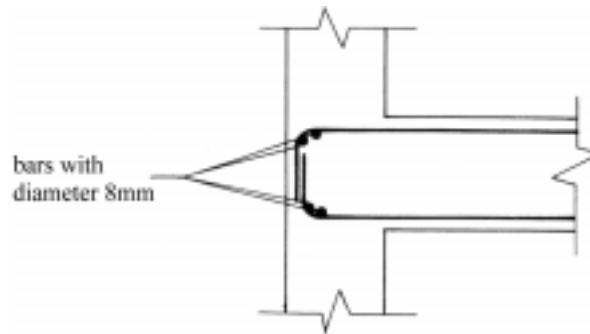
The provision of transverse reinforcement was made to ensure the anchorage of the beam bars in the joint region
